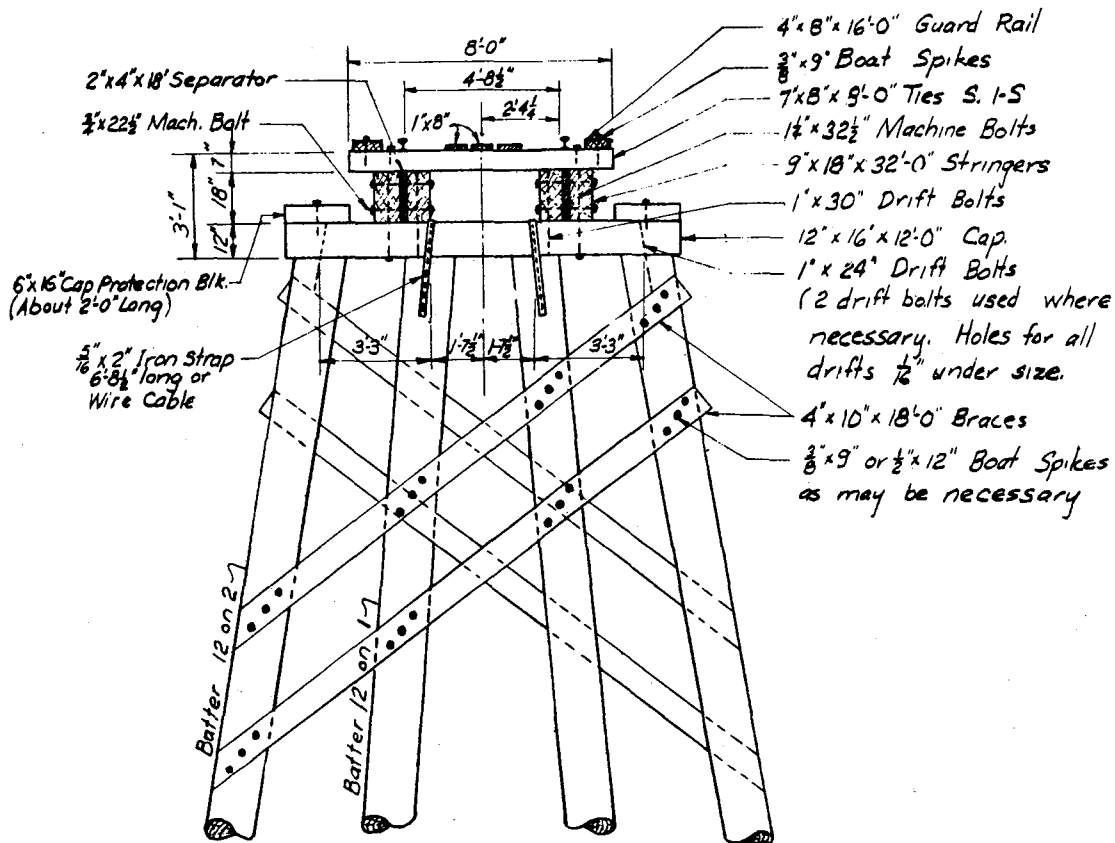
Detail of Jetty Trestle, South Jetty, Columbia River, Oregon
